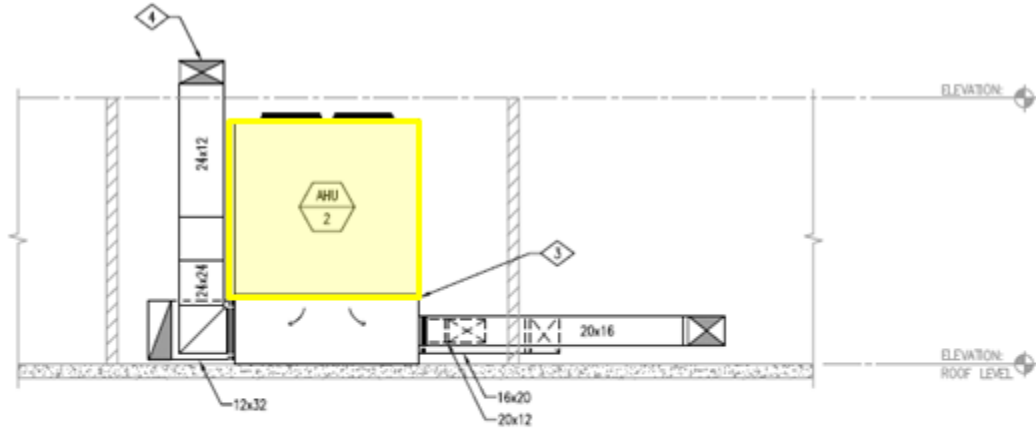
shows the location of the AHU-2 on a floor plan of the roof level of the structure
